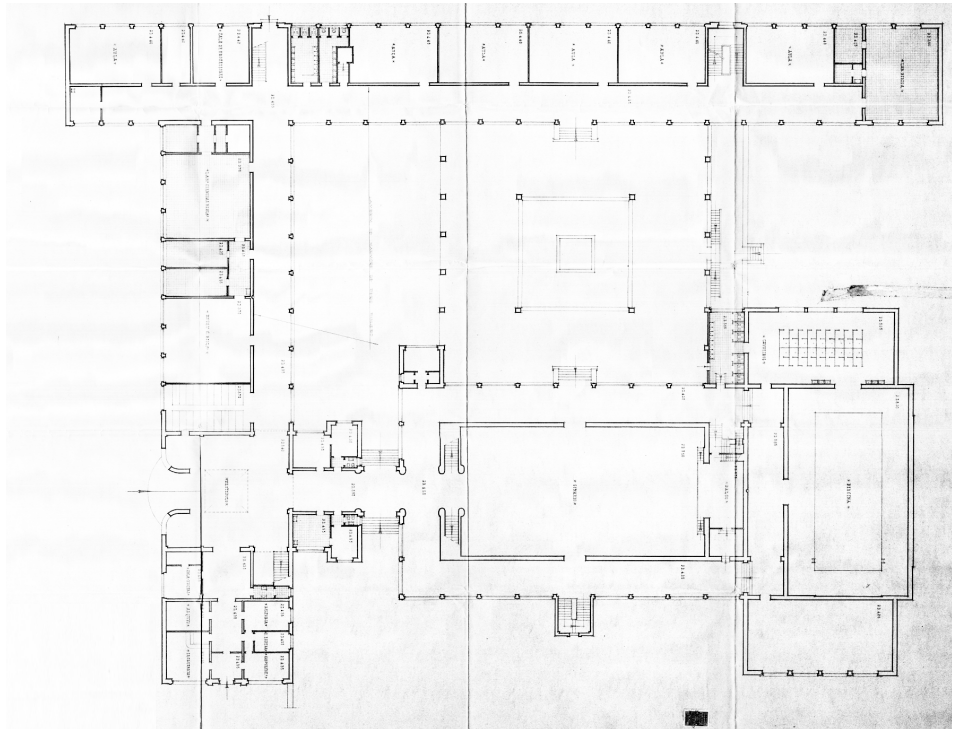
Ground floor plan of the design for Liceu Diogo Gouveia, in Beja.
